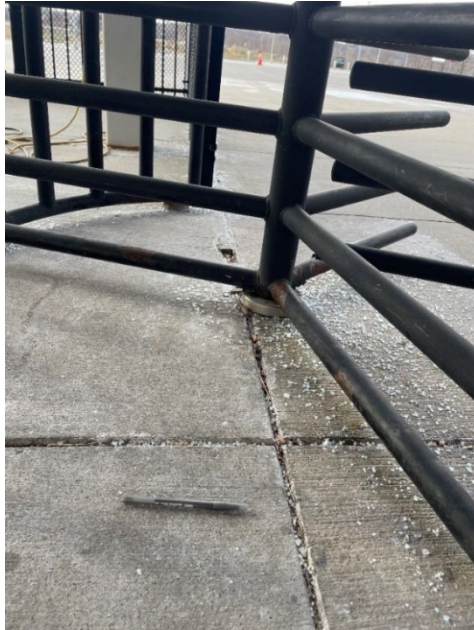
Concrete Discoloration and Eroded Concrete Column
